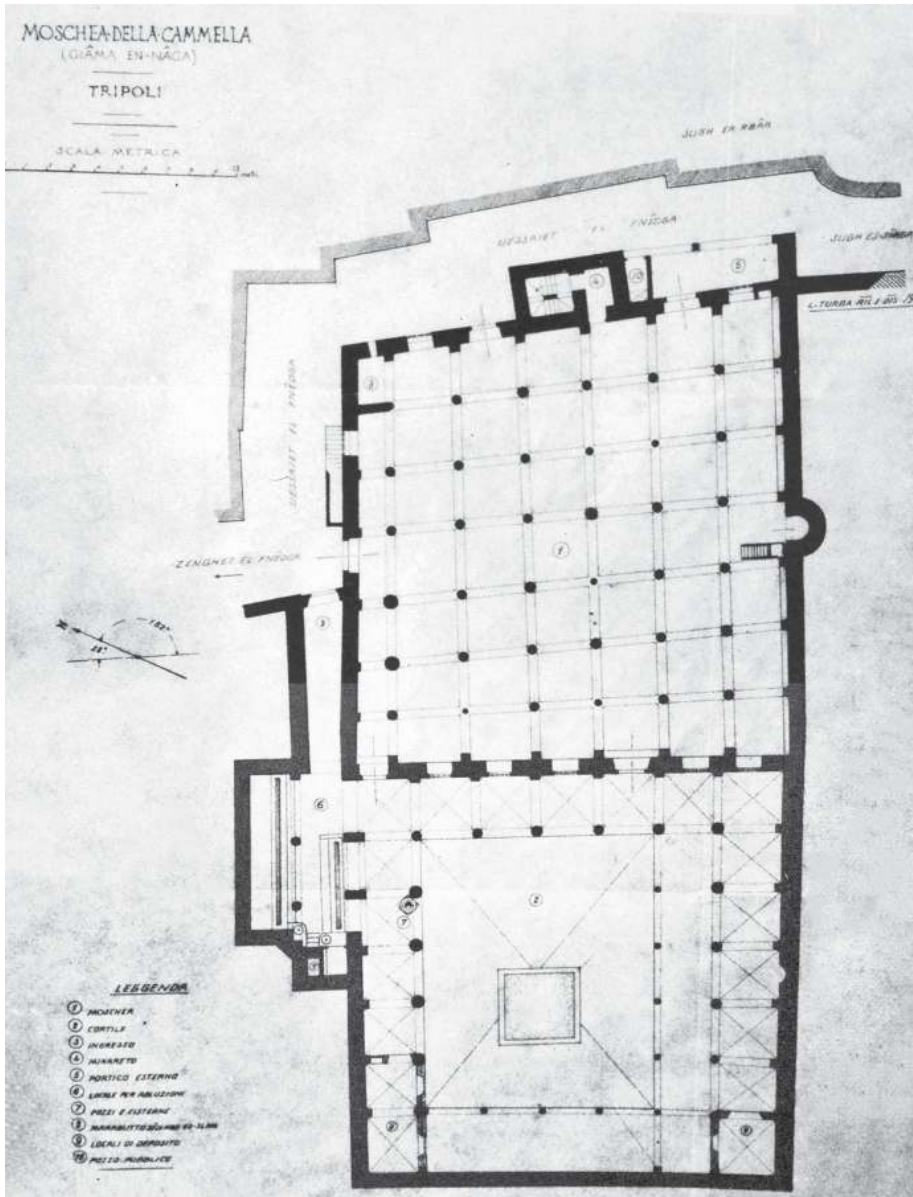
Jāmi' an-Nāqa, floor plan of the courtyard and the prayer hall.
